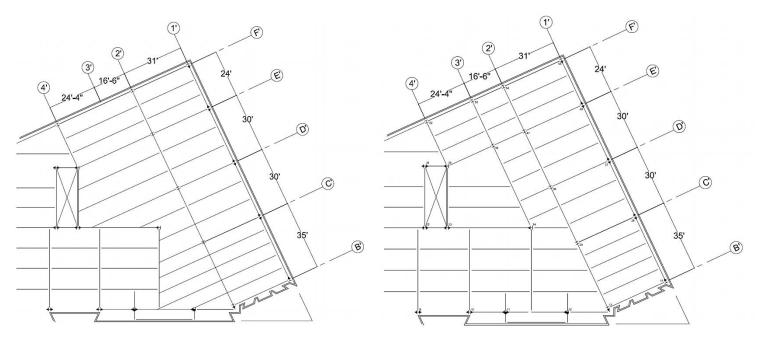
Original (left) and final (right) design of framing layout in tilted building region
